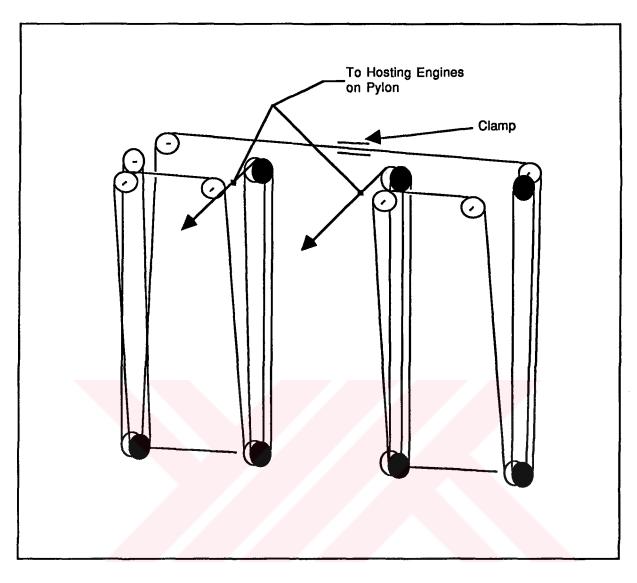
SCHEMATIC DELINEATION OF THE LIFTING ROPE ARRANGEMENT OF THE LITTLE BELT BRIDGE
